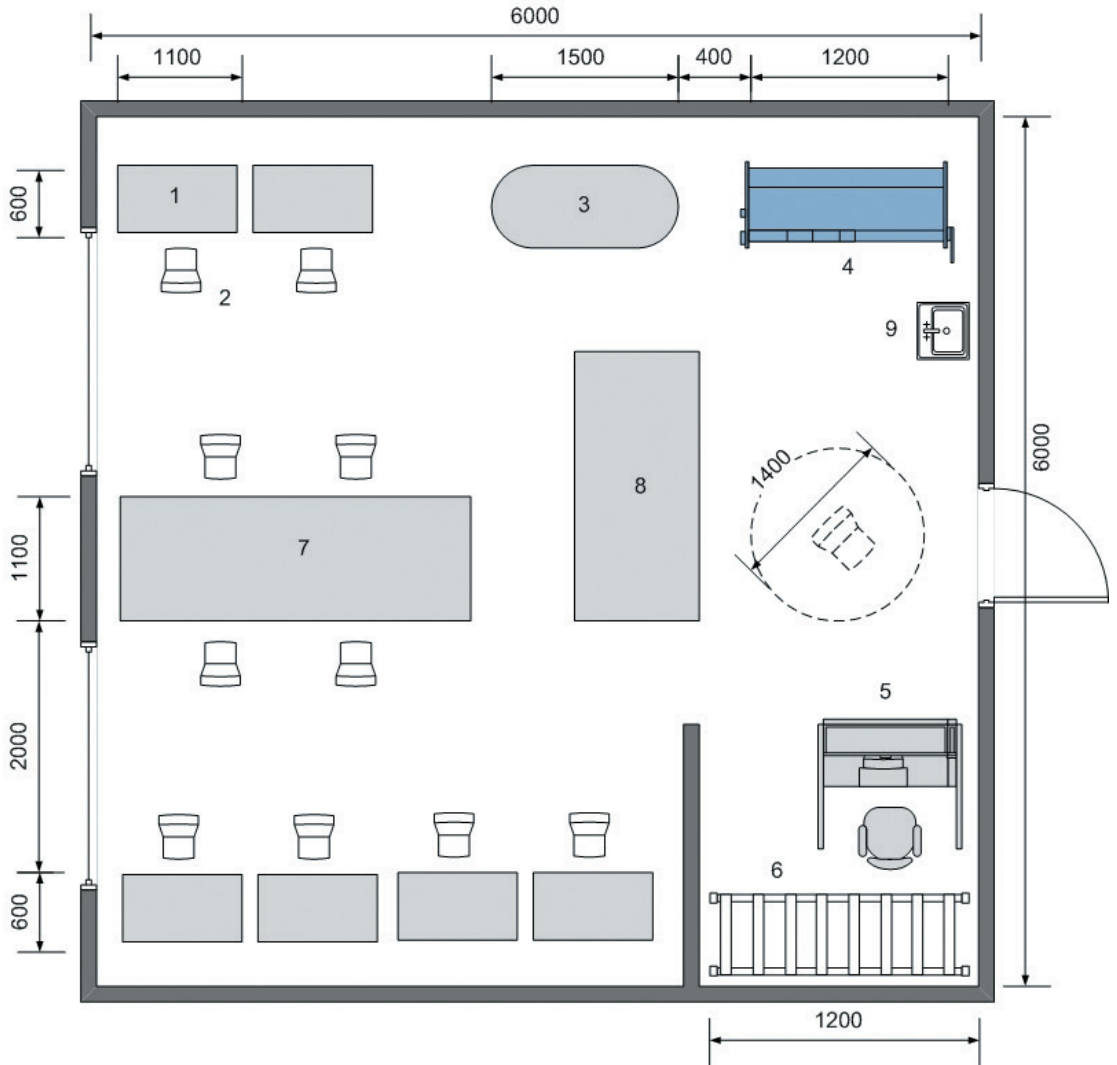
Layout of a sewing workshop adapted to the work of convicts
